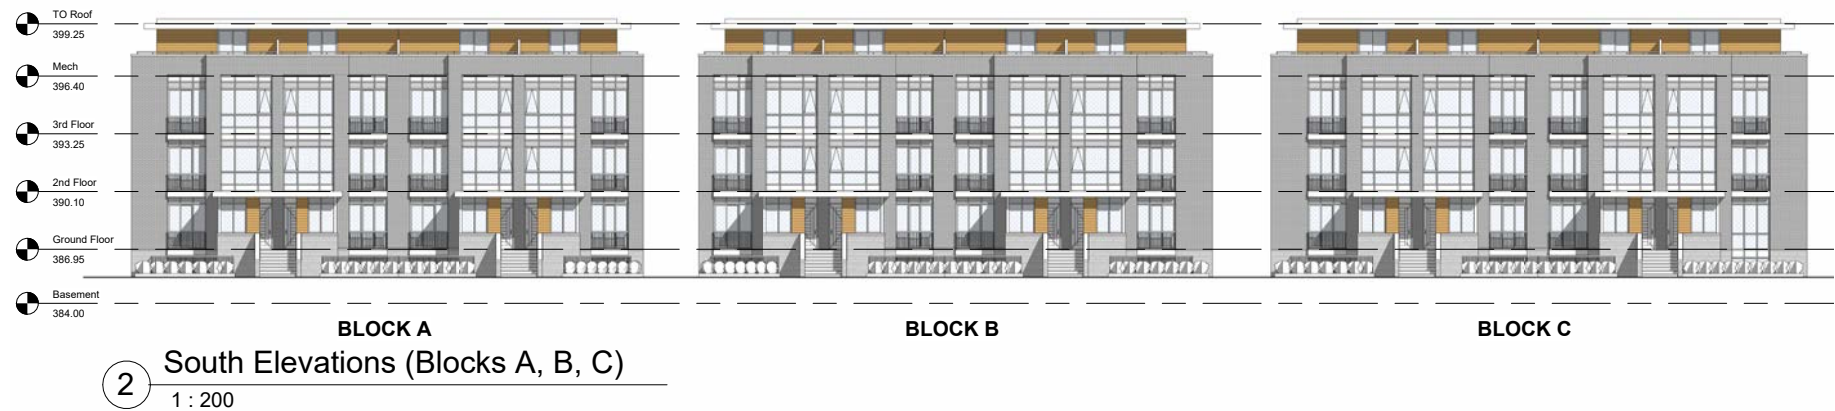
Phase 1: Proposed elevations of Stacked Back-to-Back Townhouses
